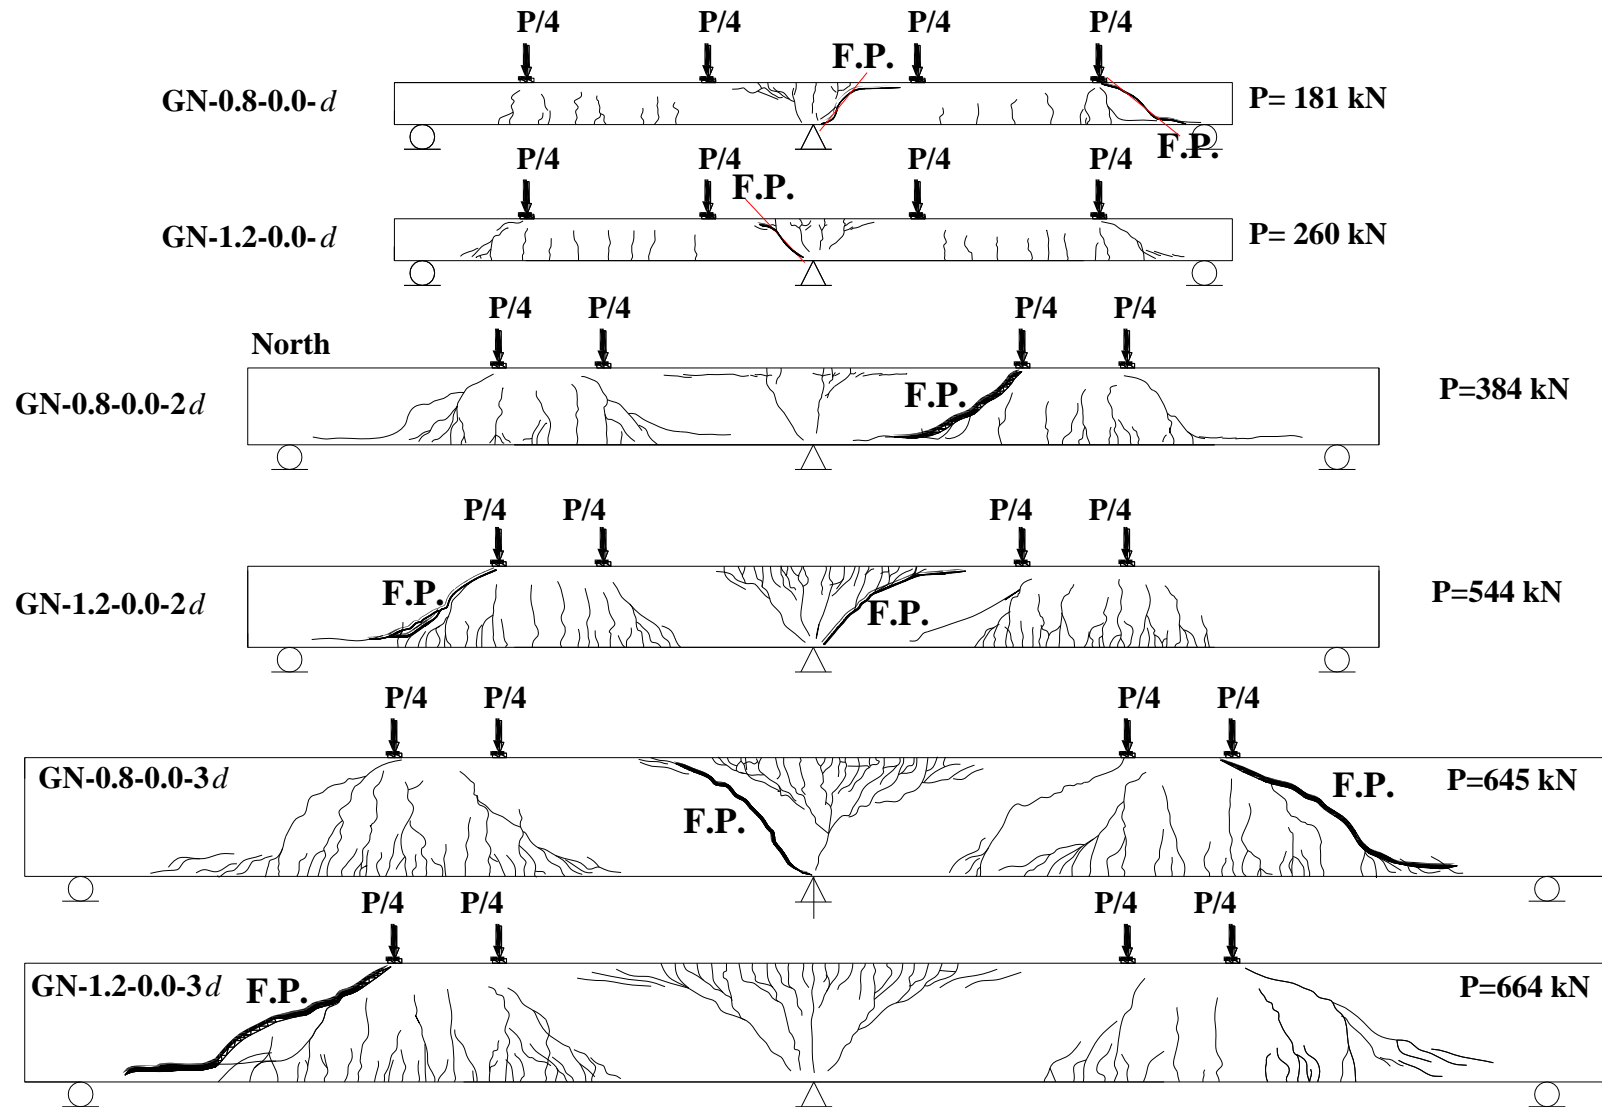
Cracking pattern at failure of NSC beams of Series II
